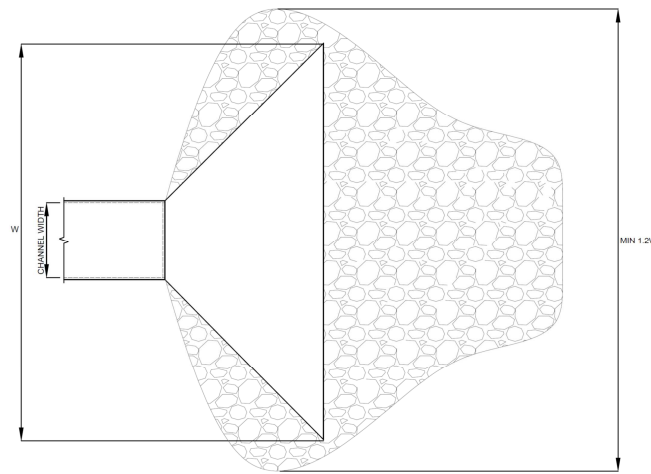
A plan view of a drainage channel to concrete apron to rip rap (after Caltrans, 2003).
